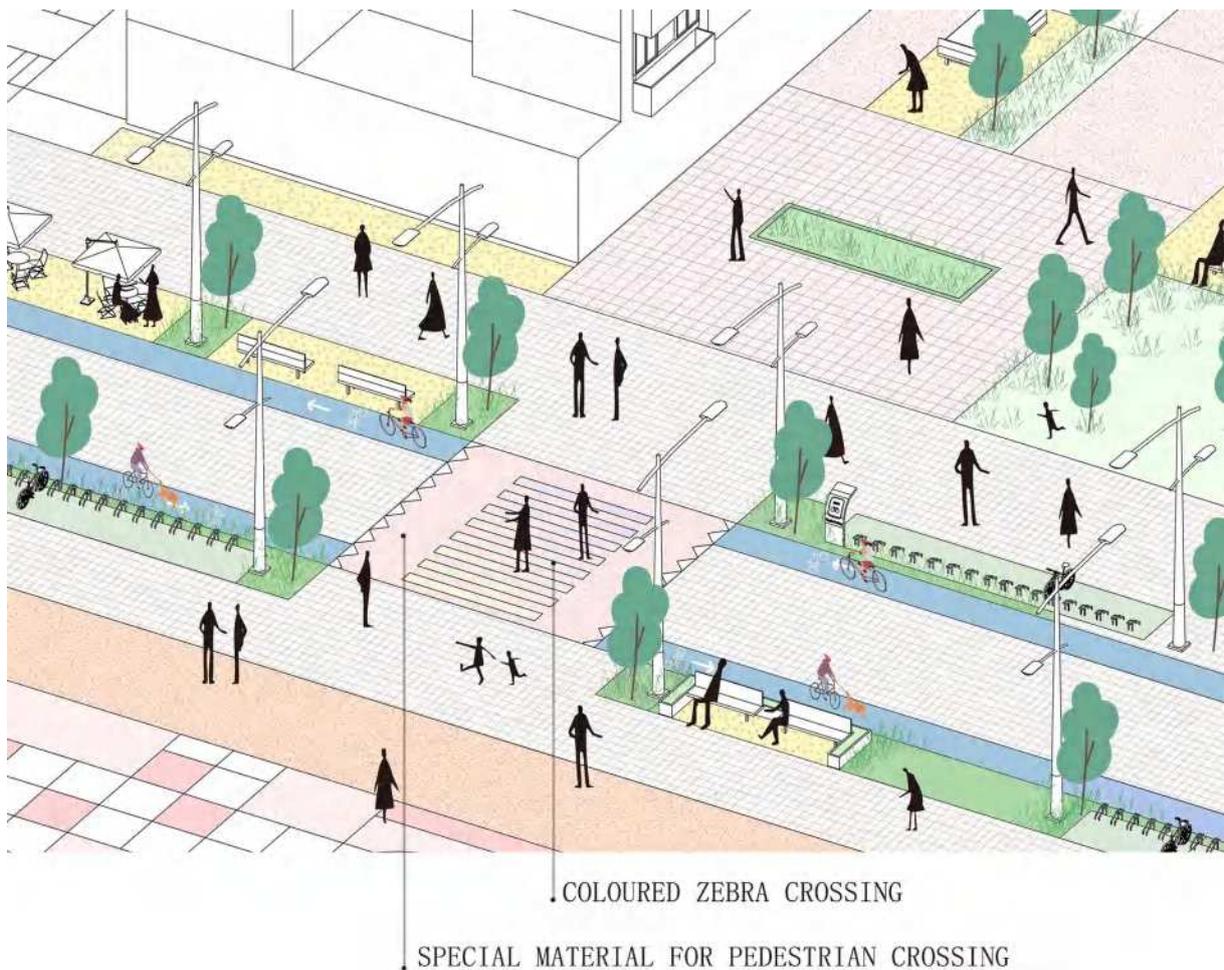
Axonometric view of pedestrians crossing the street. (Source: Completed by author)
